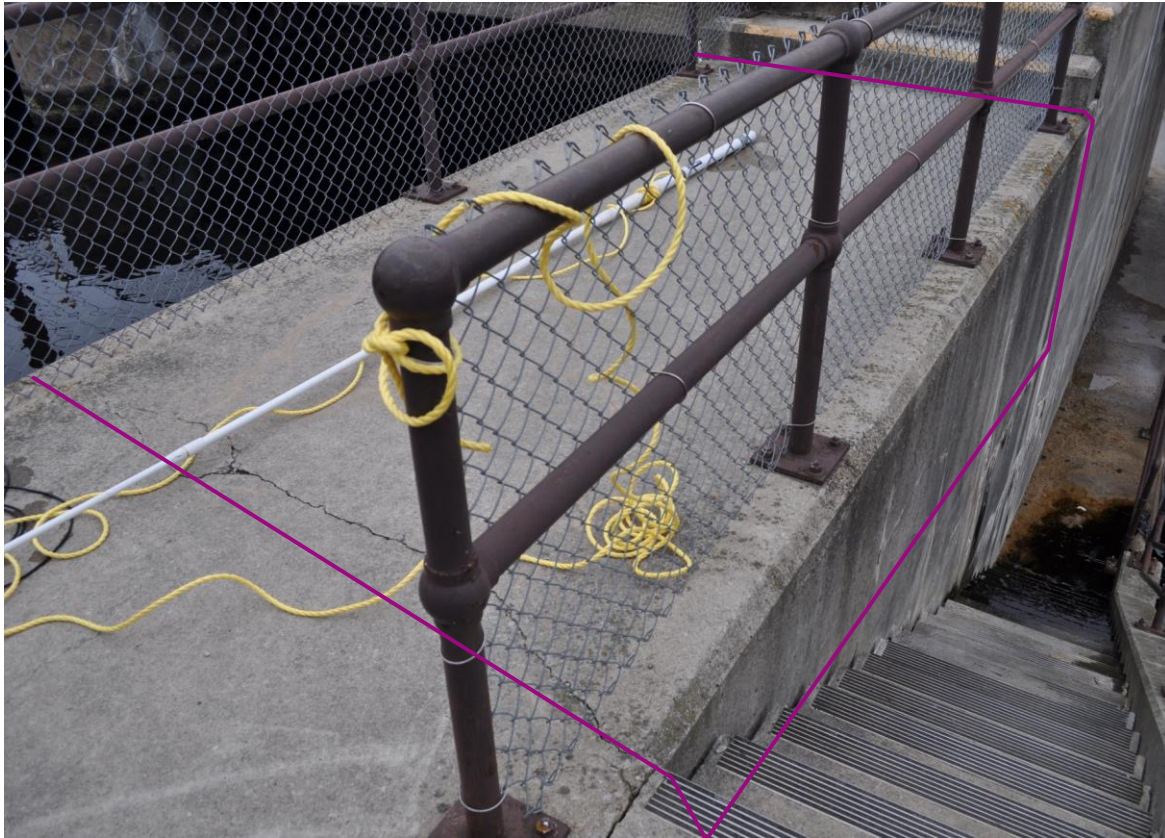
System of cracks and joints at the top of the stairs
